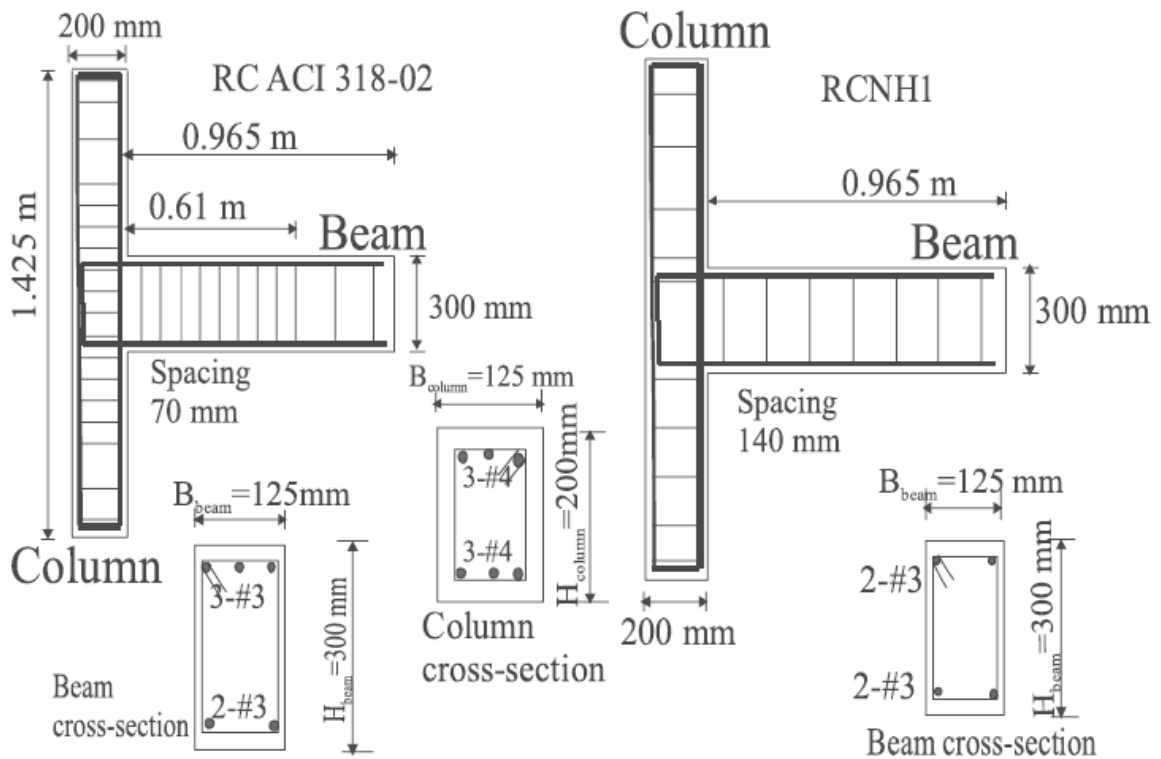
Reinforcement details of exterior beam-column joint specimens [Gencoglu and Mobasher 1993]
